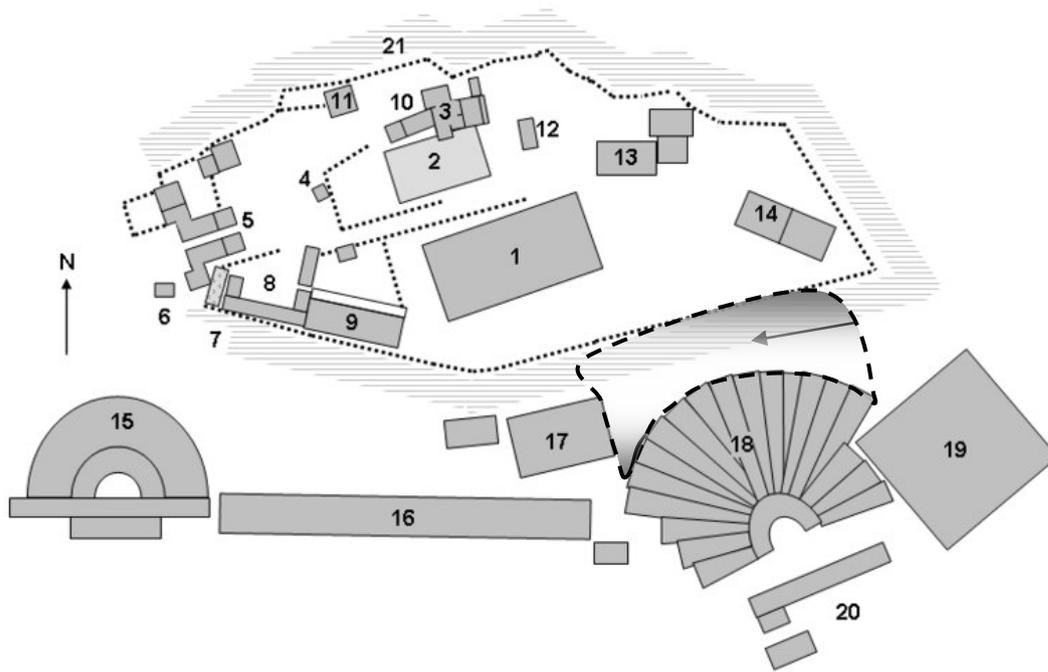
The draining areas A.1 & A.2 (in the site plan of the Acropolis) (plan of Madmedea, arranged by K. Kollyropoulos)
